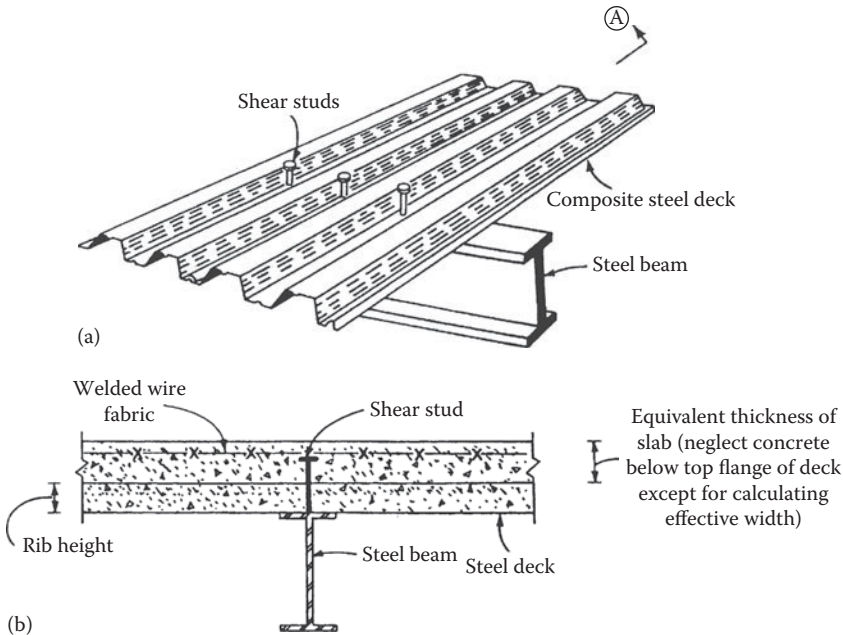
Composite beam with deck ribs perpendicular to beam: (a) schematic view; (b) section showing equivalent thickness of slab.
